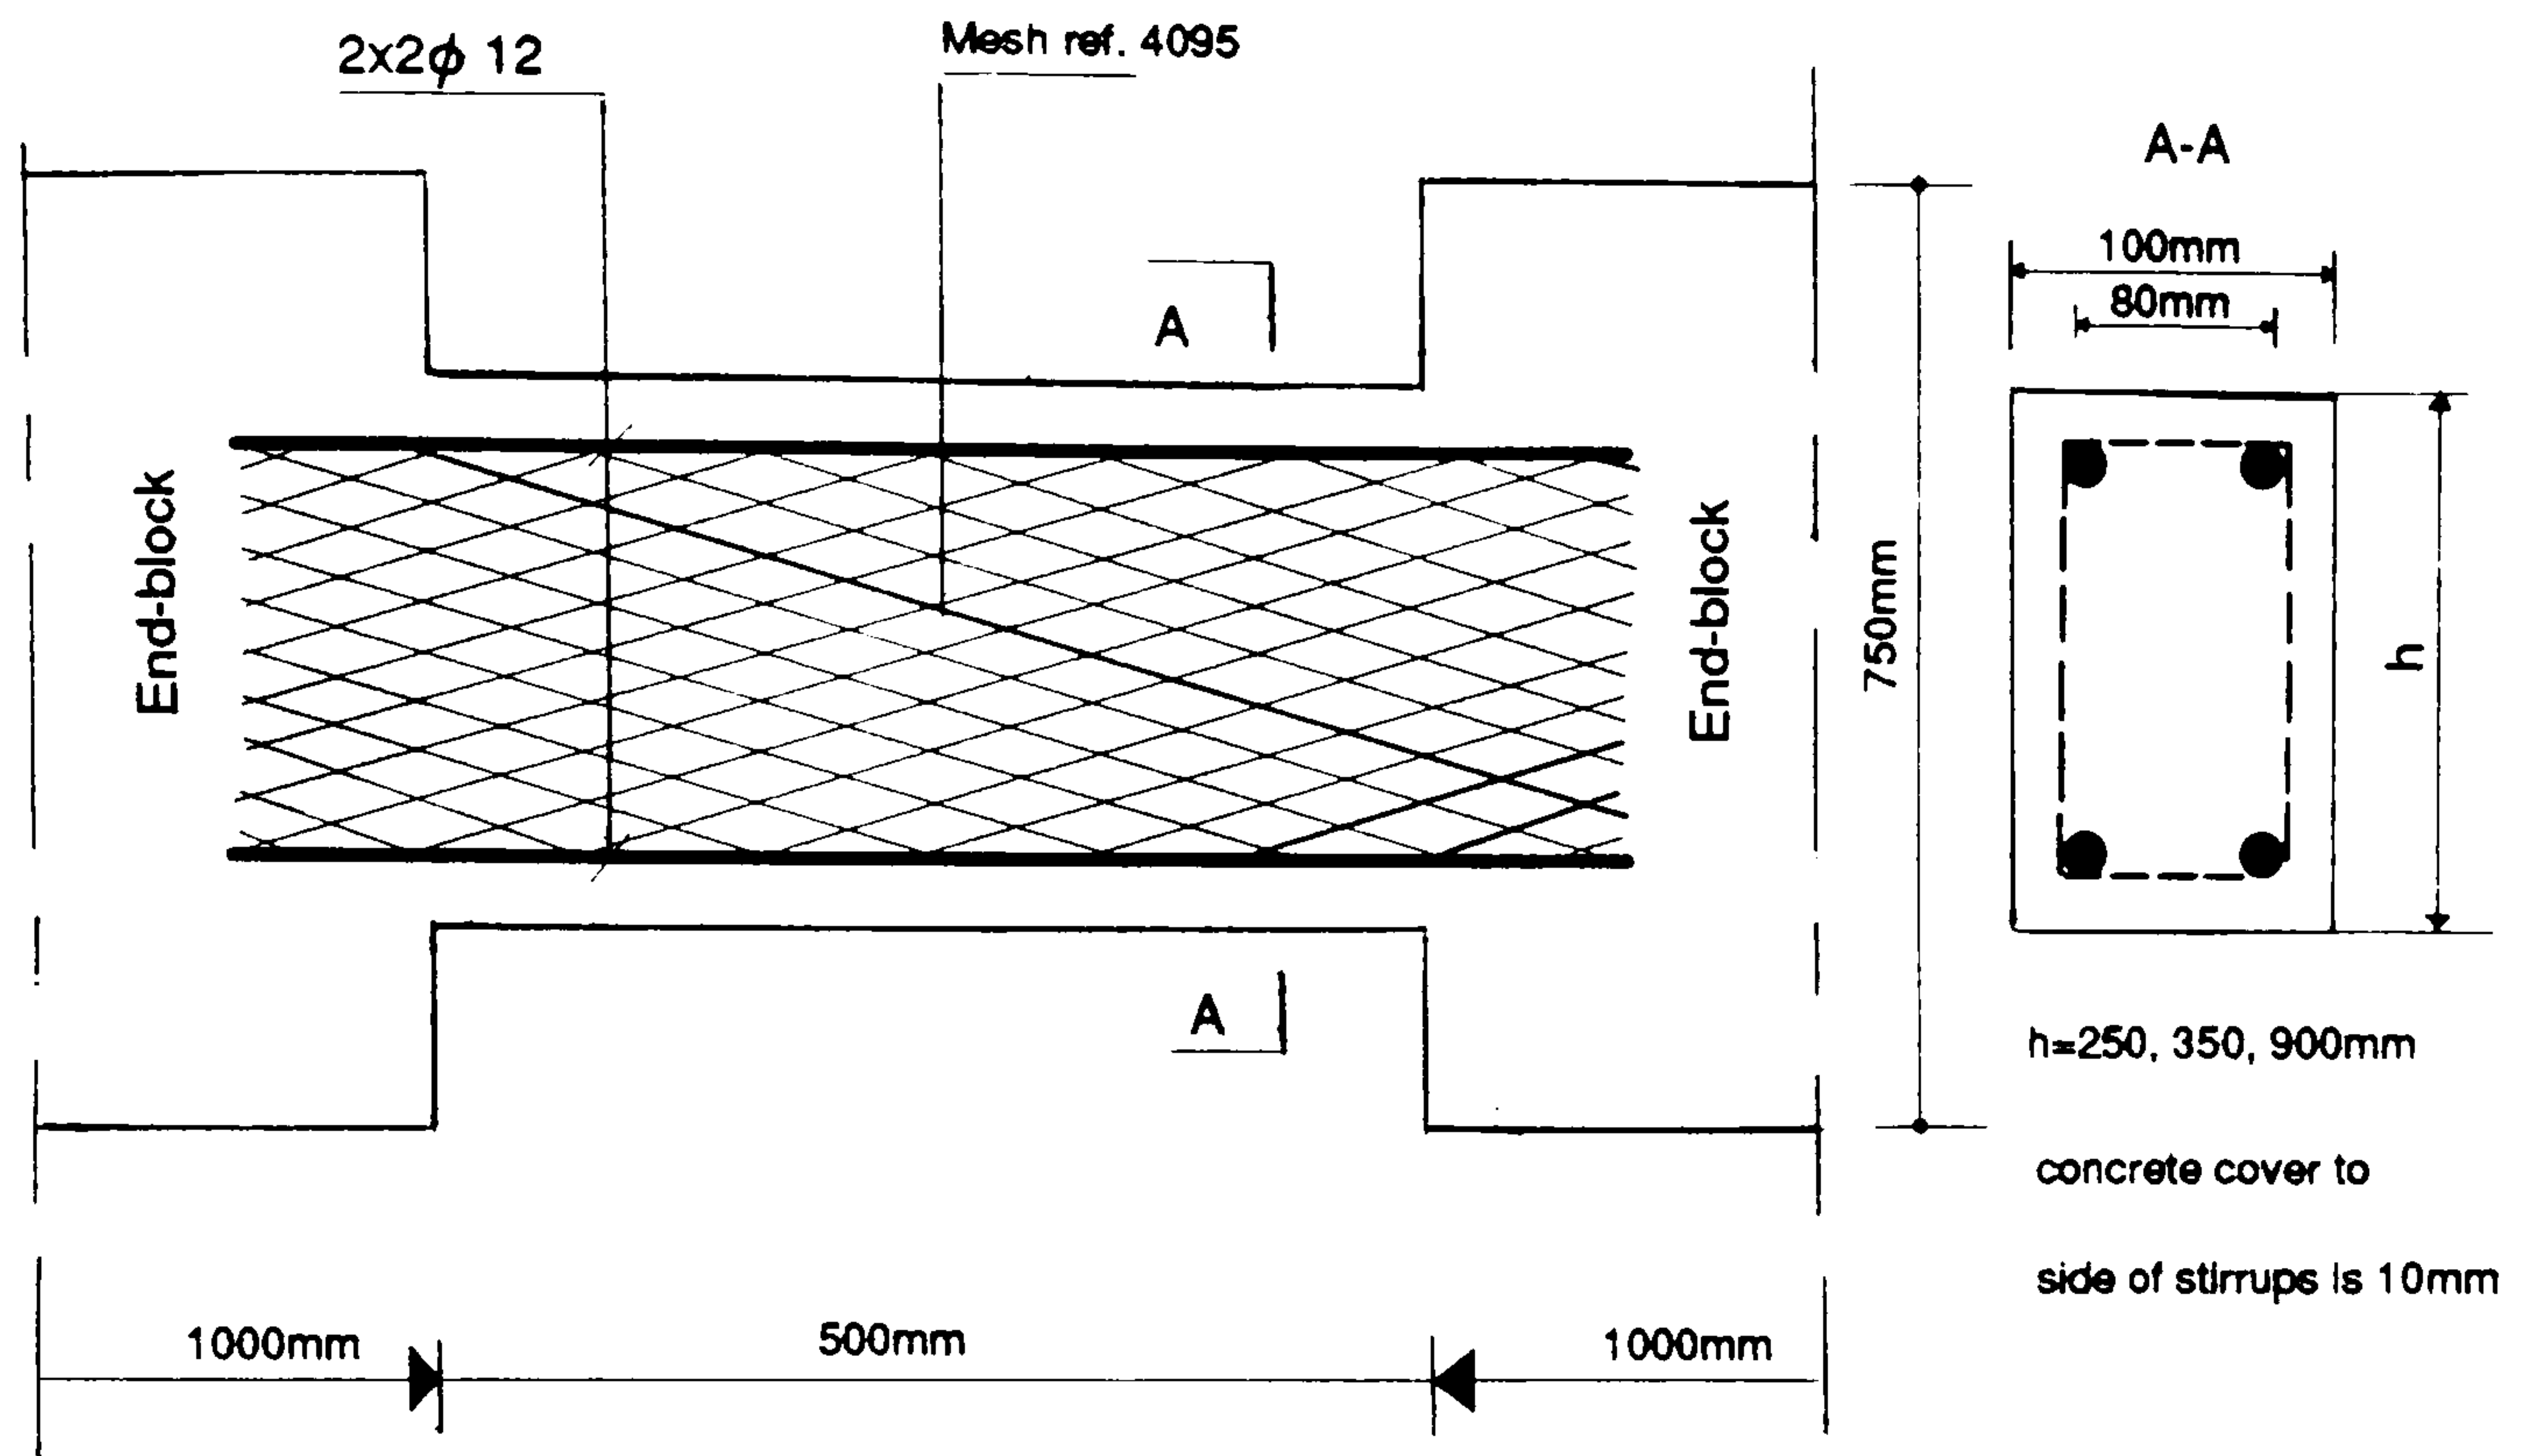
Dimensions of the coupling beam reinforced only with mesh
